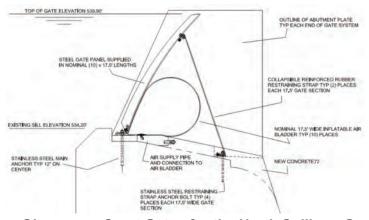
New Obermeyer Crest Gates for the North Spillway Section
